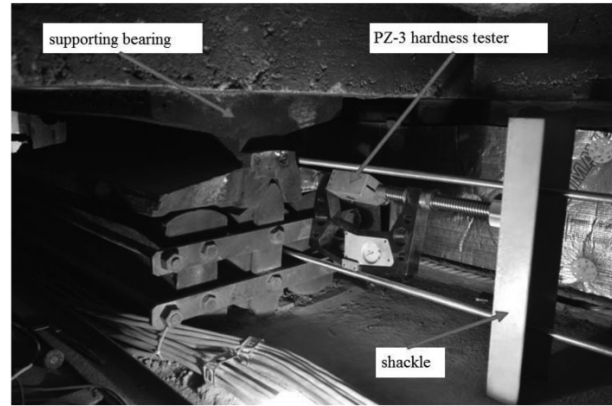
The mobile Brinell tester while carrying out measurements.
